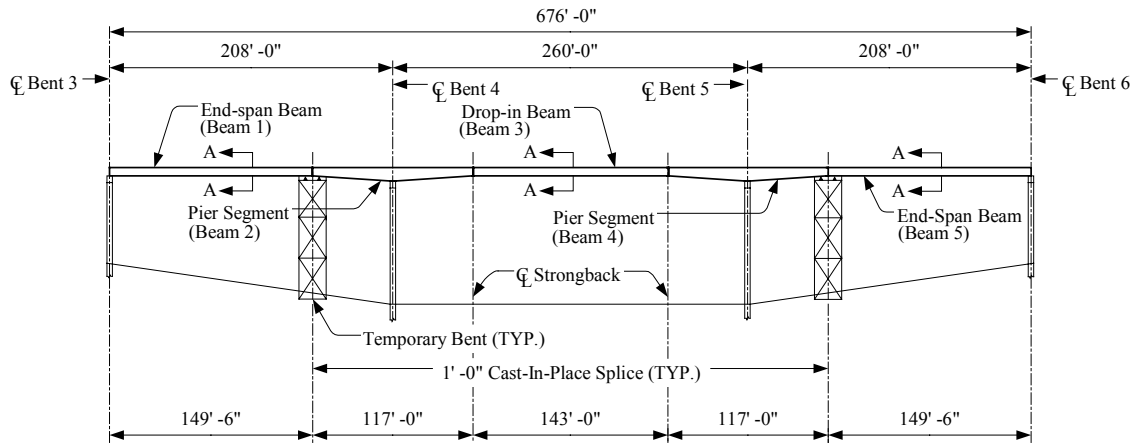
Elevation View of Black Warrior Parkway Spliced-Girder Bridge
